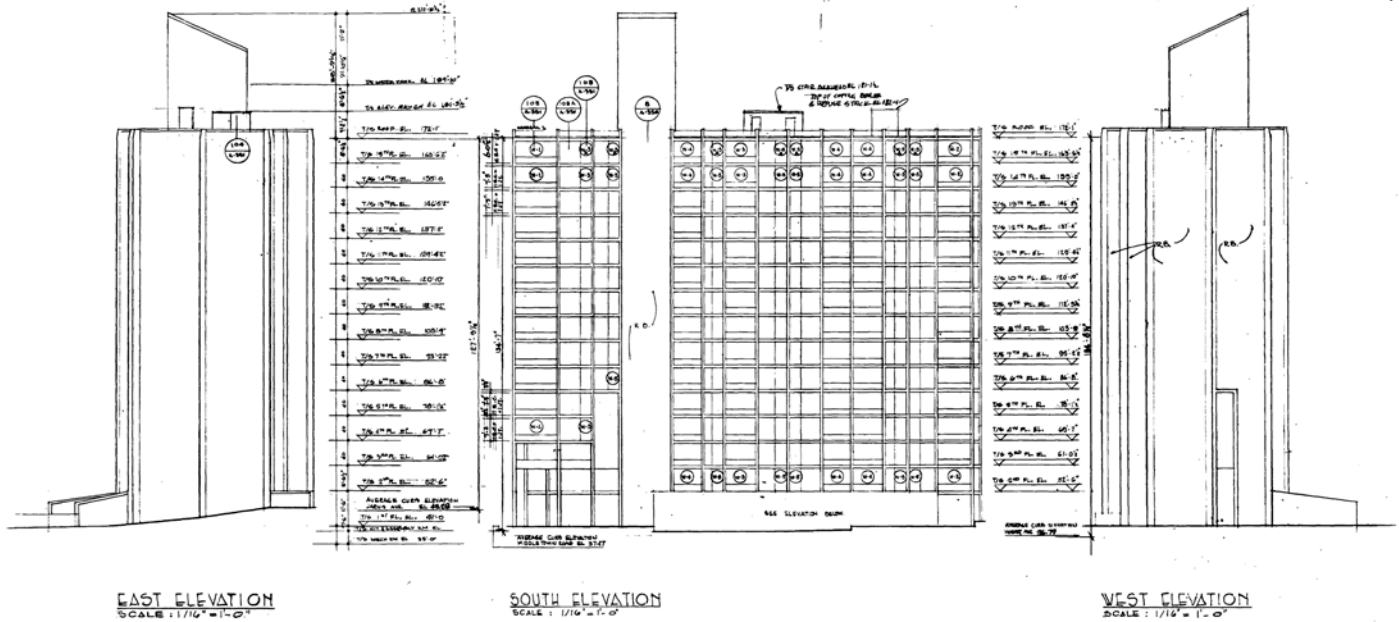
Drawing of the south elevation and the two secondary east and west elevations, 1969. (NYCHA)
